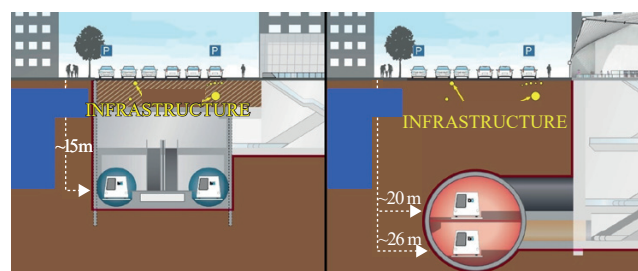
Examples of station design solutions for single- and double-track tunnels [8]
